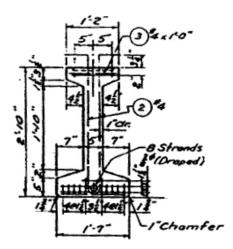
Bridge 5/227 50 ft. Series Girder
